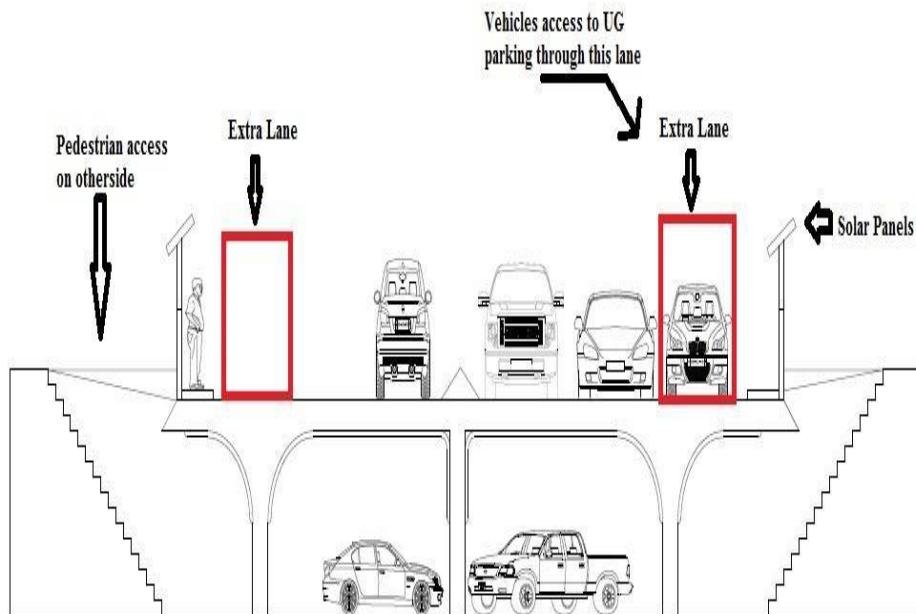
Shows the underground parking + extra lane for vehicles usage + solar panels + stair case on both ends of the road.
